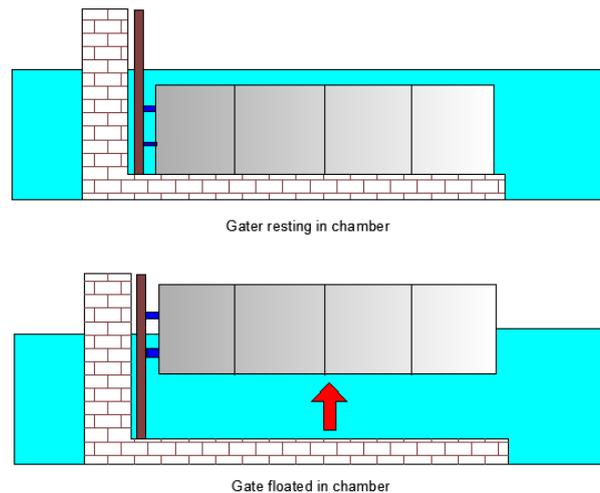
5. Barge gate in open position, not to scale (cross section 1-1')
